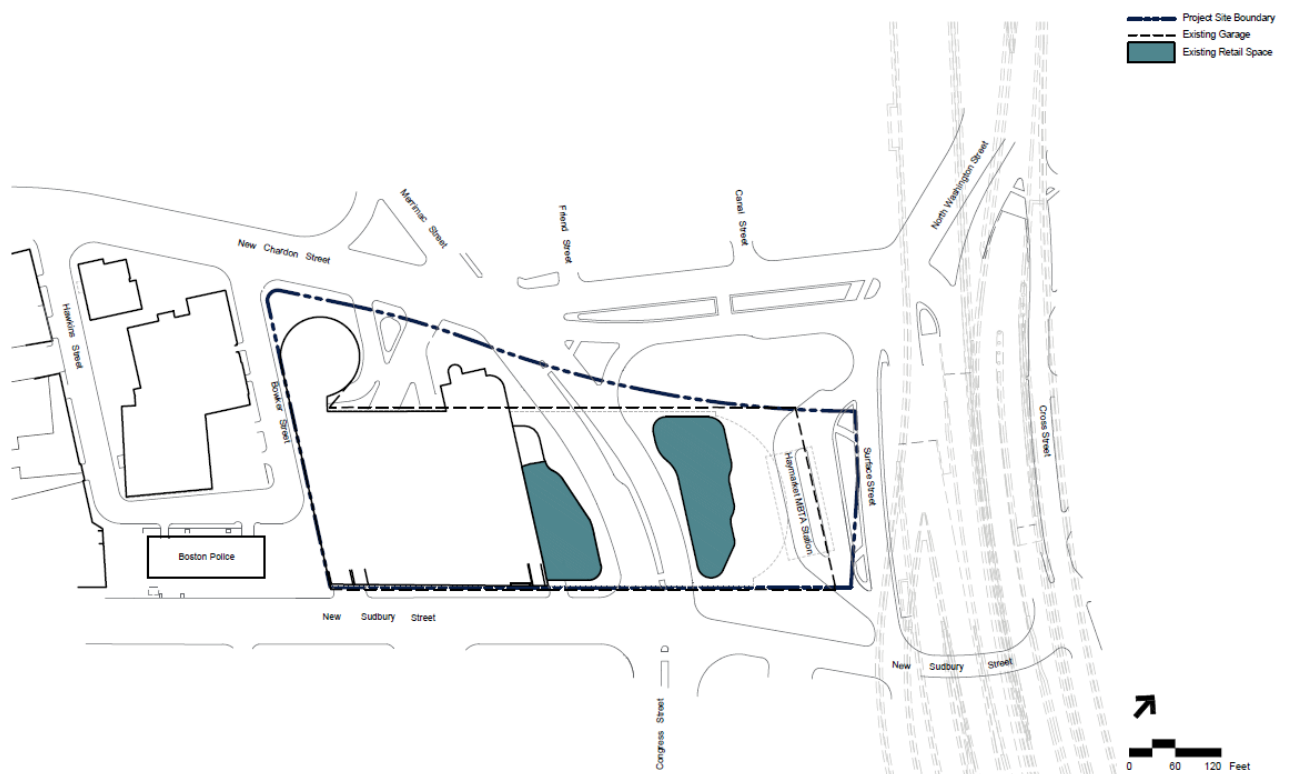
Government Center Garage, Existing Conditions Site Plan
